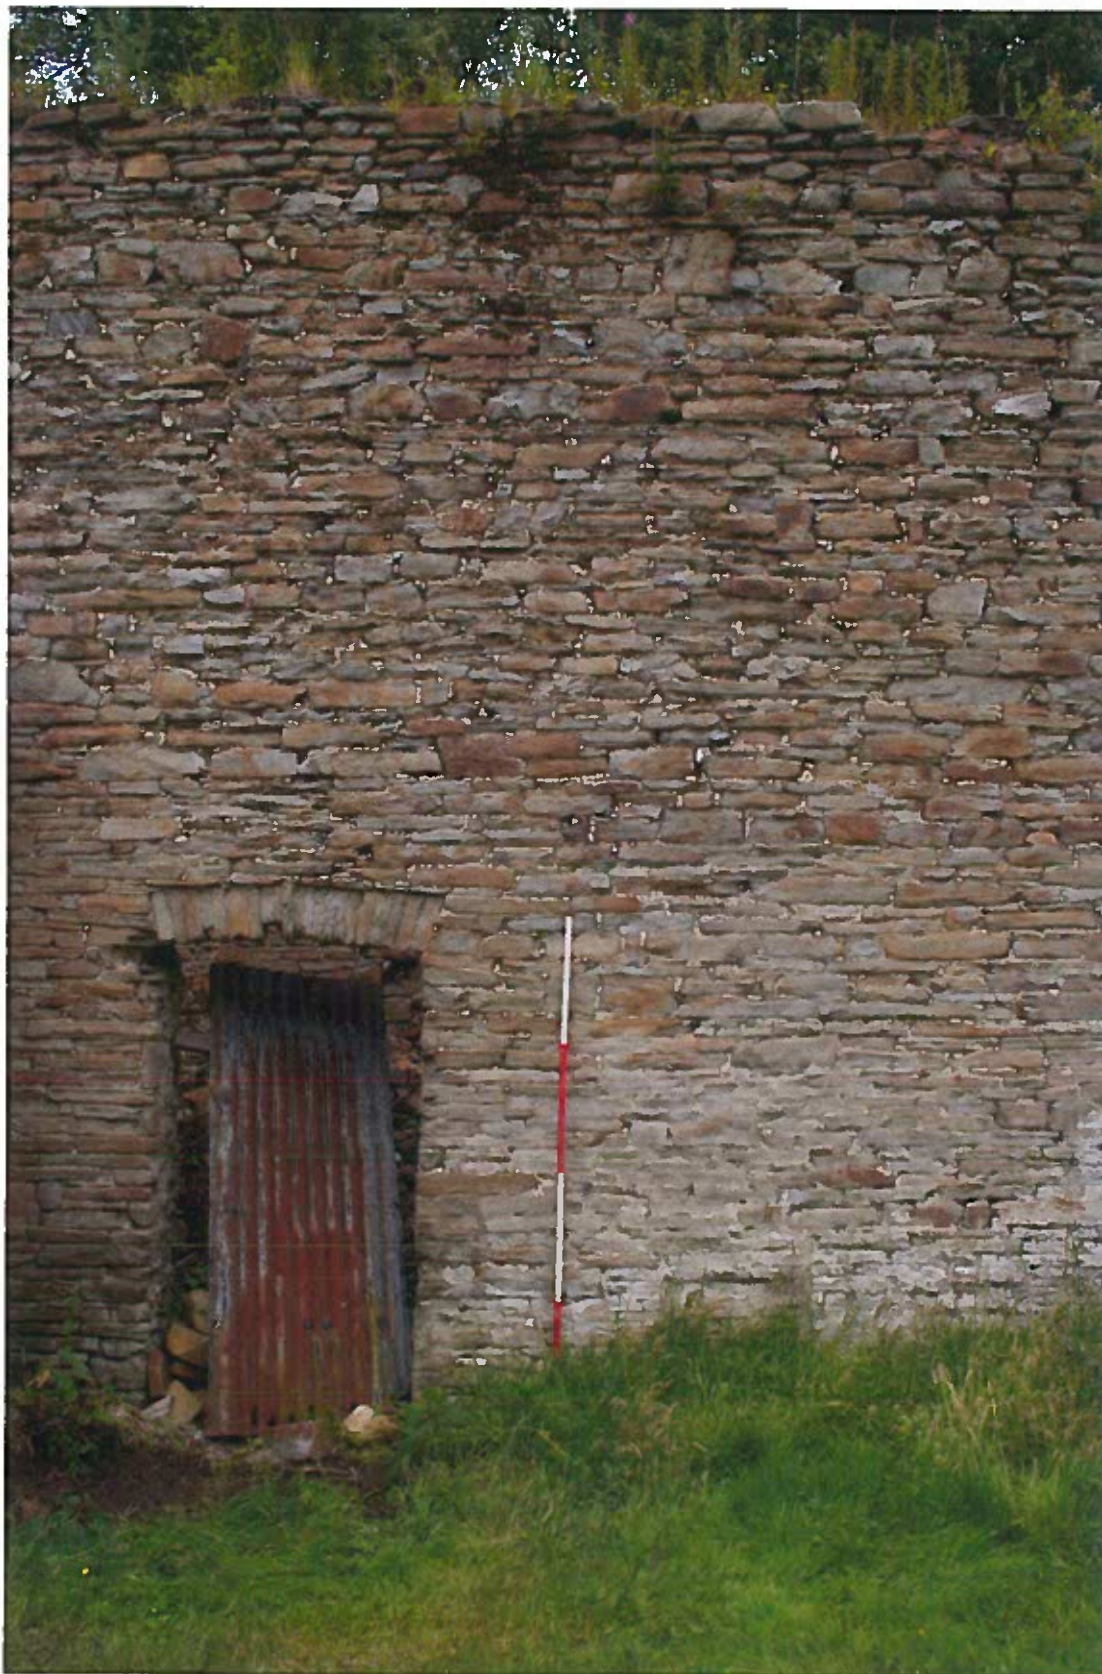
Mill front wall from southwest showing doorway. Shot 5.
